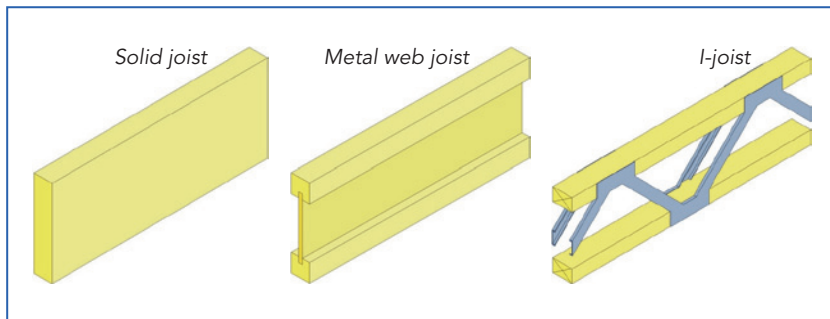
Examples of separating floor joists [[2] - (U.K)].
